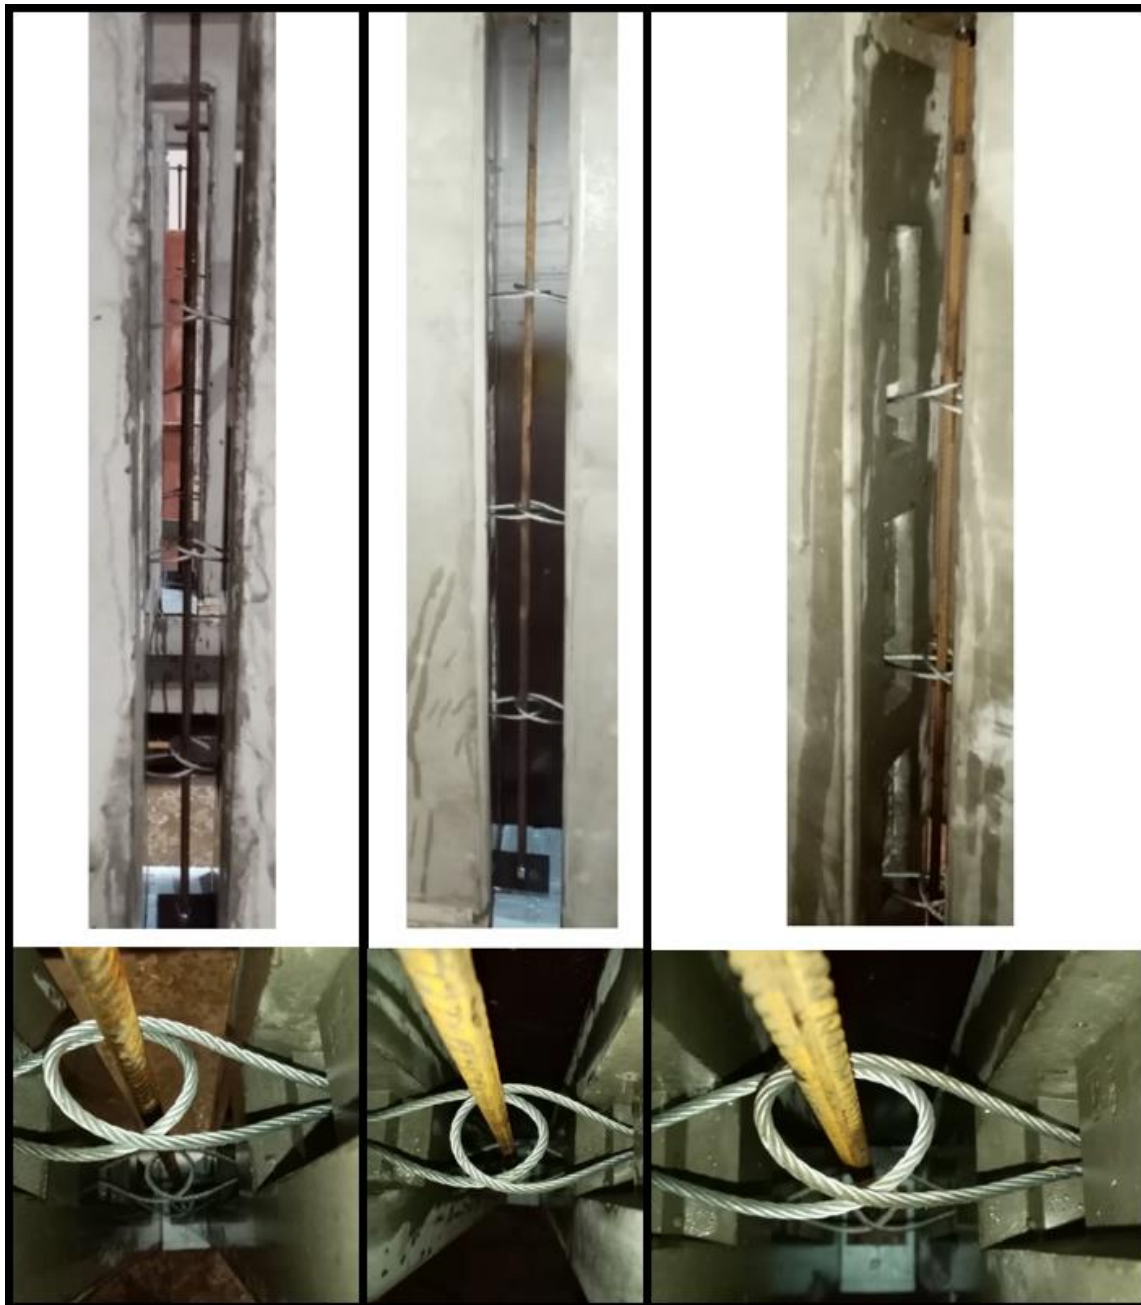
Test specimens before joint casting (from left to right 1st, 2nd and 3rd test specimen)
